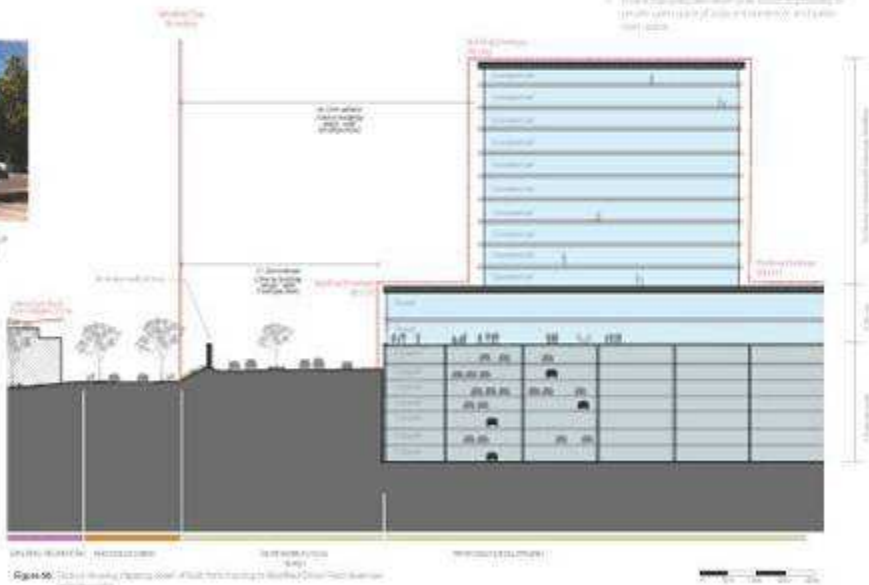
Section through proposed commercial building showing a cross-section of the building.
